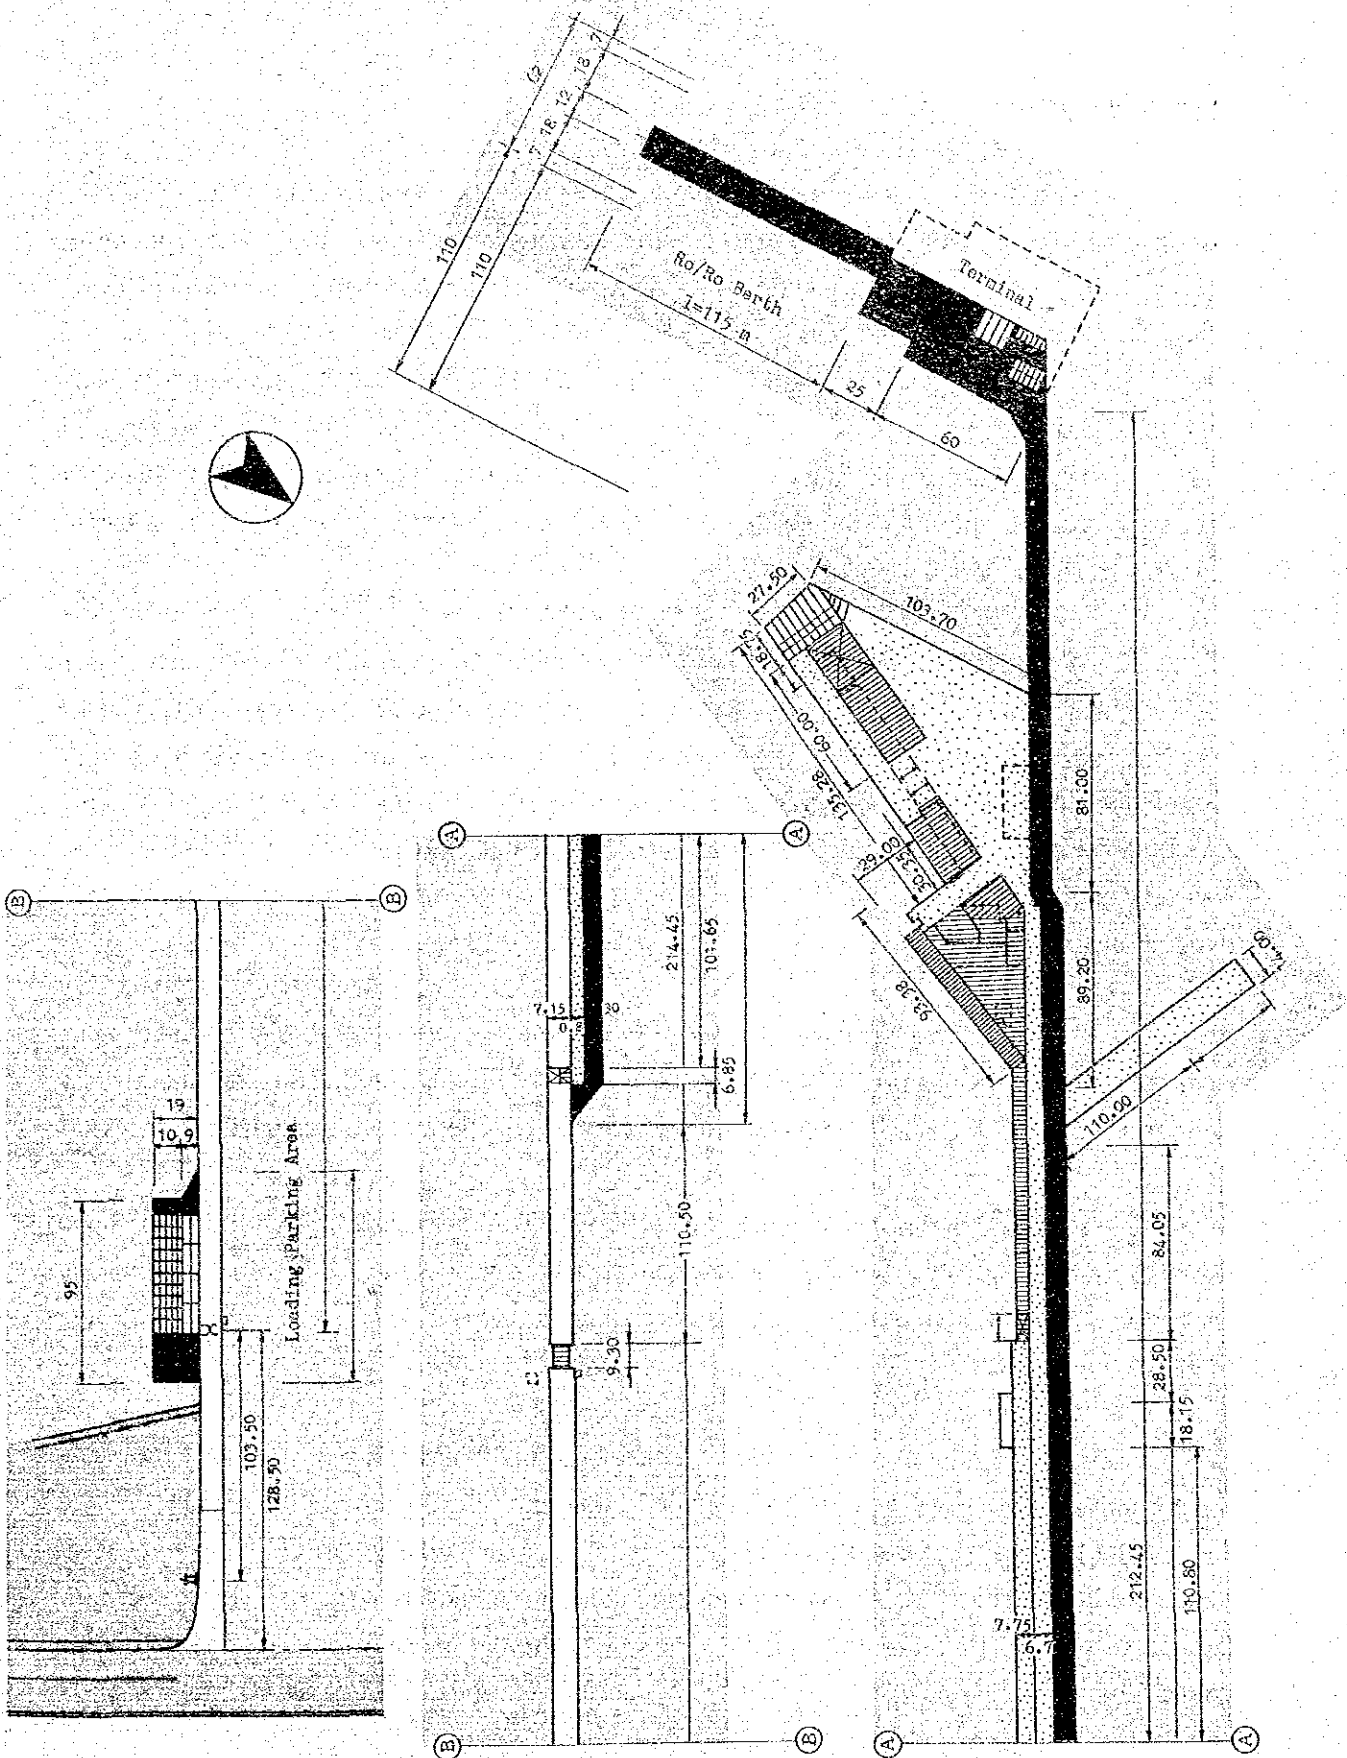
Ro/Ro Terminal Development Plan at Port of Bacolod
